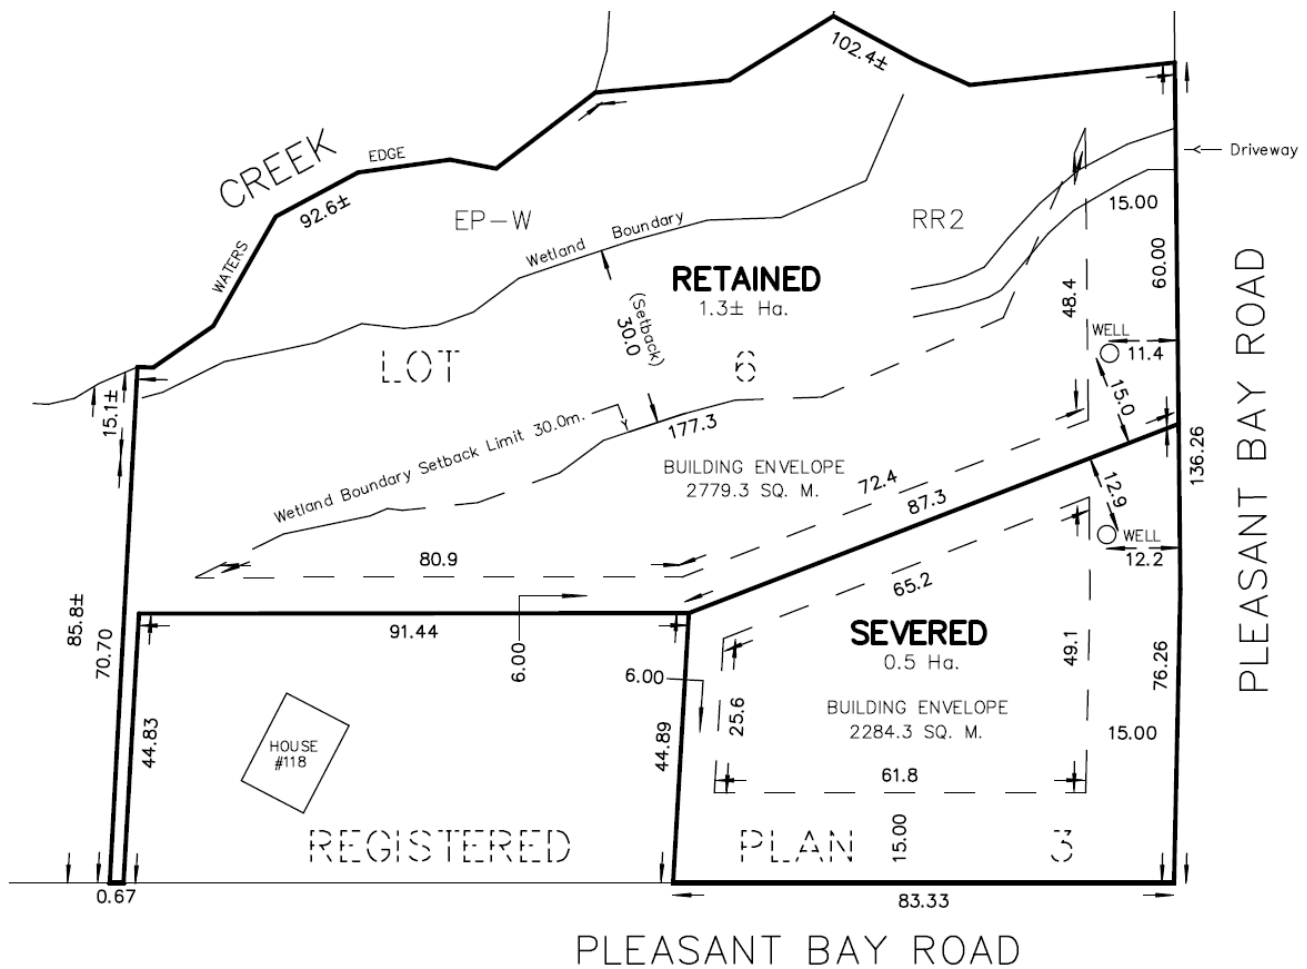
Proposed Severance Plan (Source: Watson Land Surveyors Ltd.)
